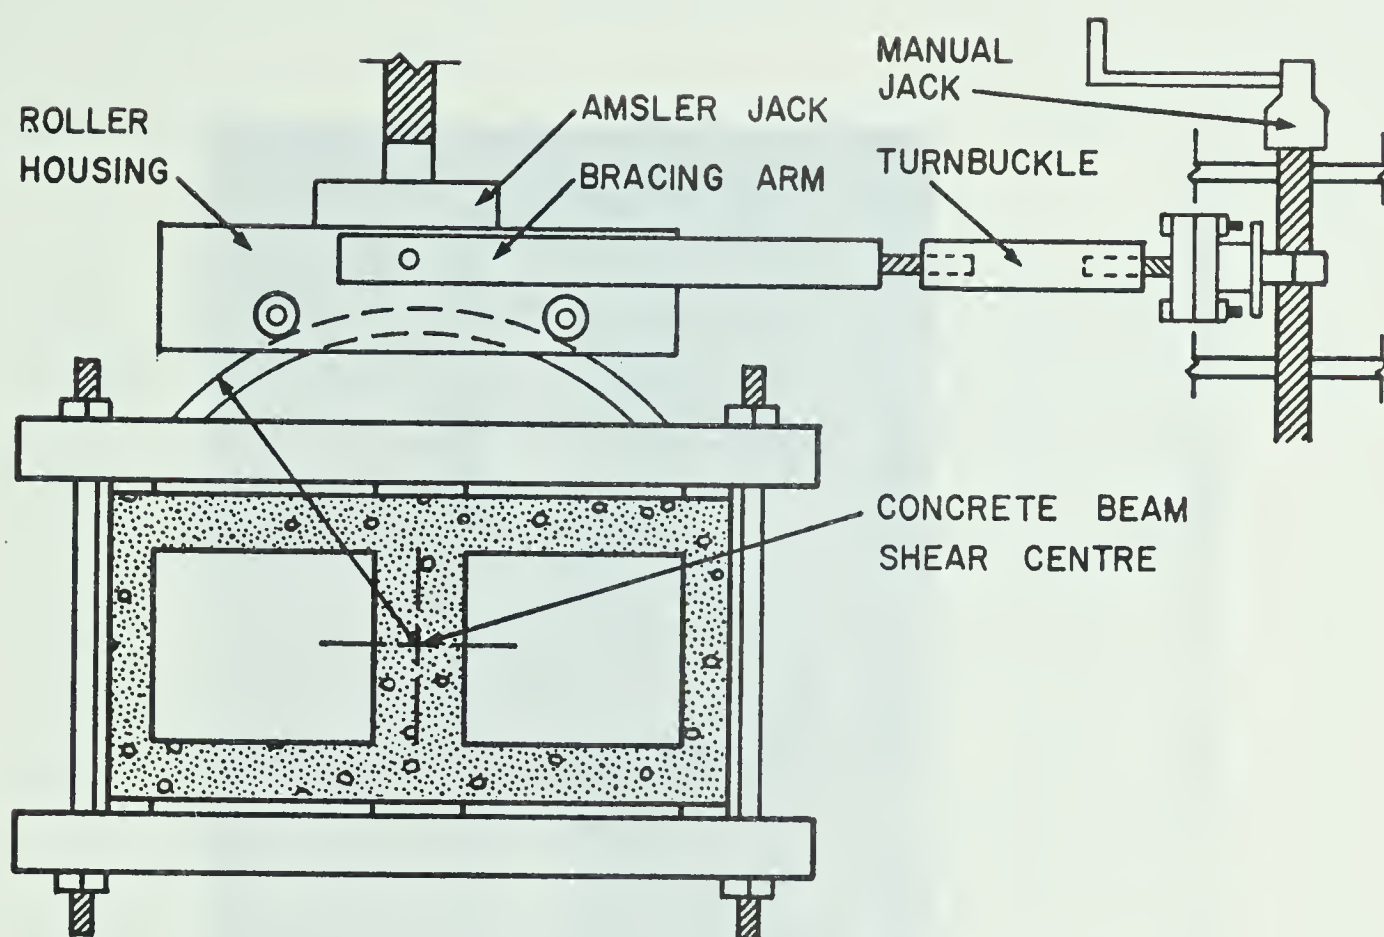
POINT LOAD APPARATUS WITH ROLLER HOUSING
